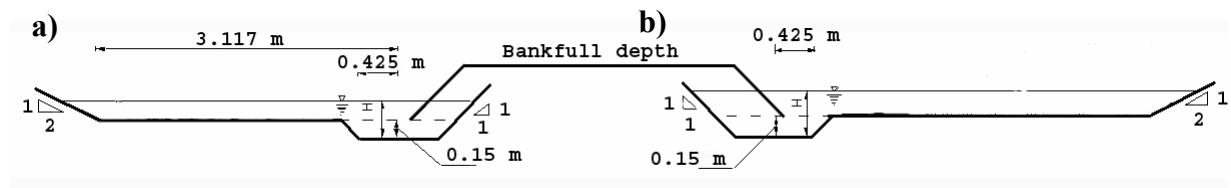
Geometry of the small-scale model at (a) section 3 and (b) section 5
